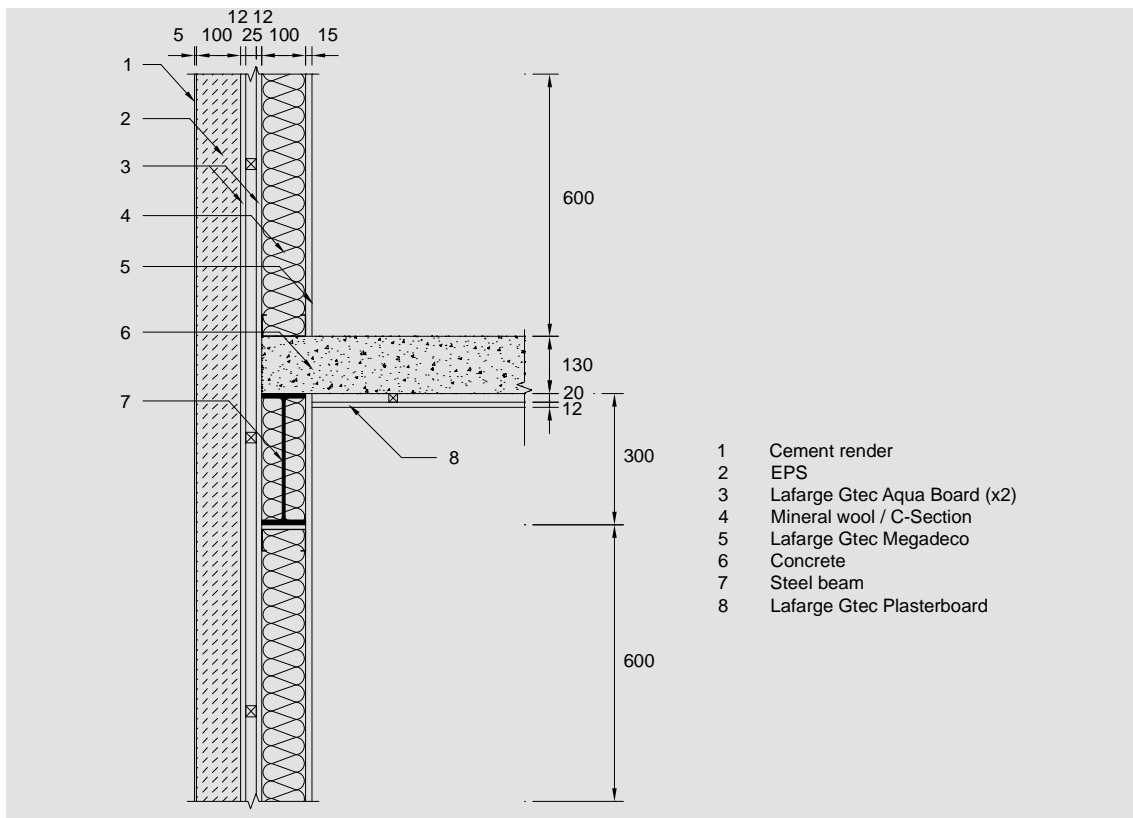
Light steel infill wall in a steel framed building –cavity system with double layers of boards is shown
